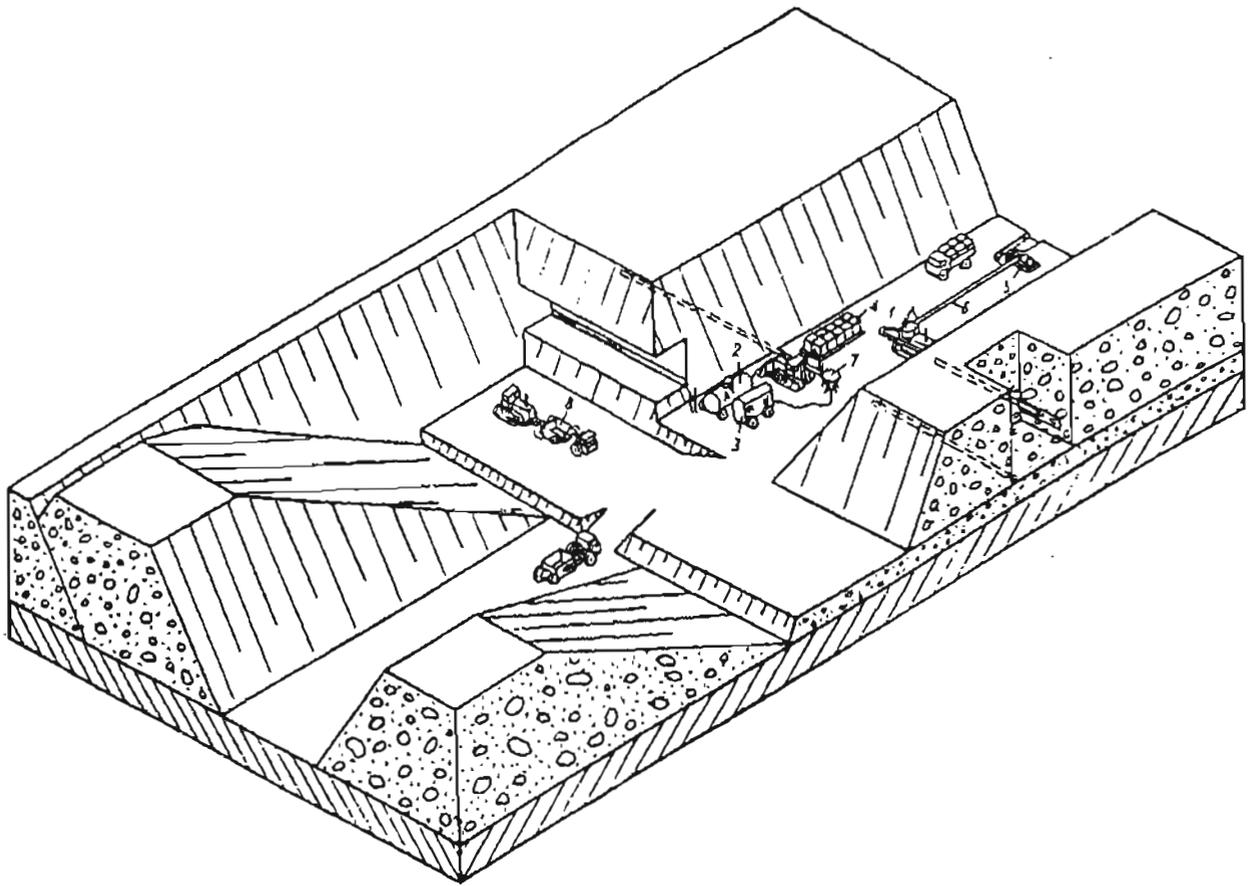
Method Orotukan of striping using a large diameter blasting, 1 -unit 'Pioneer' for hydraulic drilling and loading blastholes; 2 -diesel fuel tank; 3 compressor; 4 -trailer with ammonium nitrate, 5 -pumping station; 6 -pipeline; 7 -explosives loading machine; 8 -scraper with pusher; (VNI-1, 1981)
